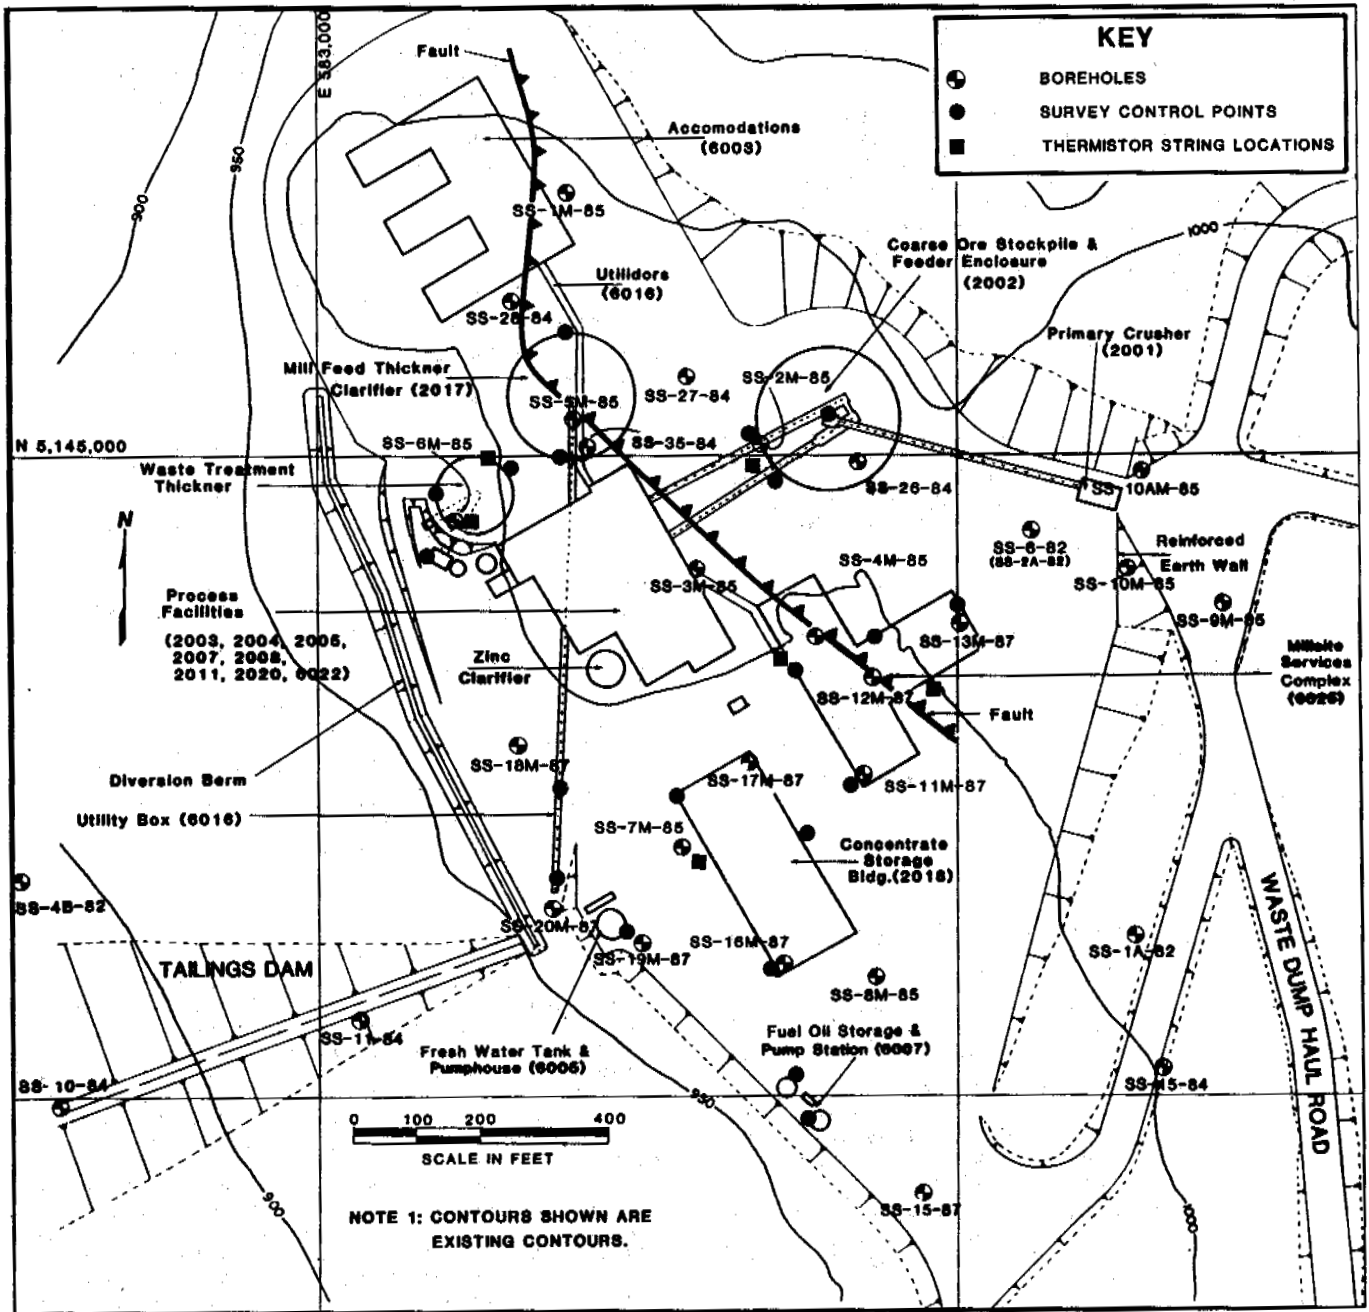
RED DOG MILL SITE PLAN AND MONITORING LOCATIONS
